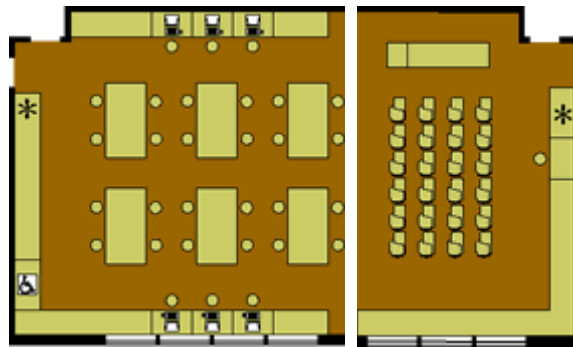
Floor plan of the Science classroom (ref: Lab Plan, <http://www.nsf.gov/>)
